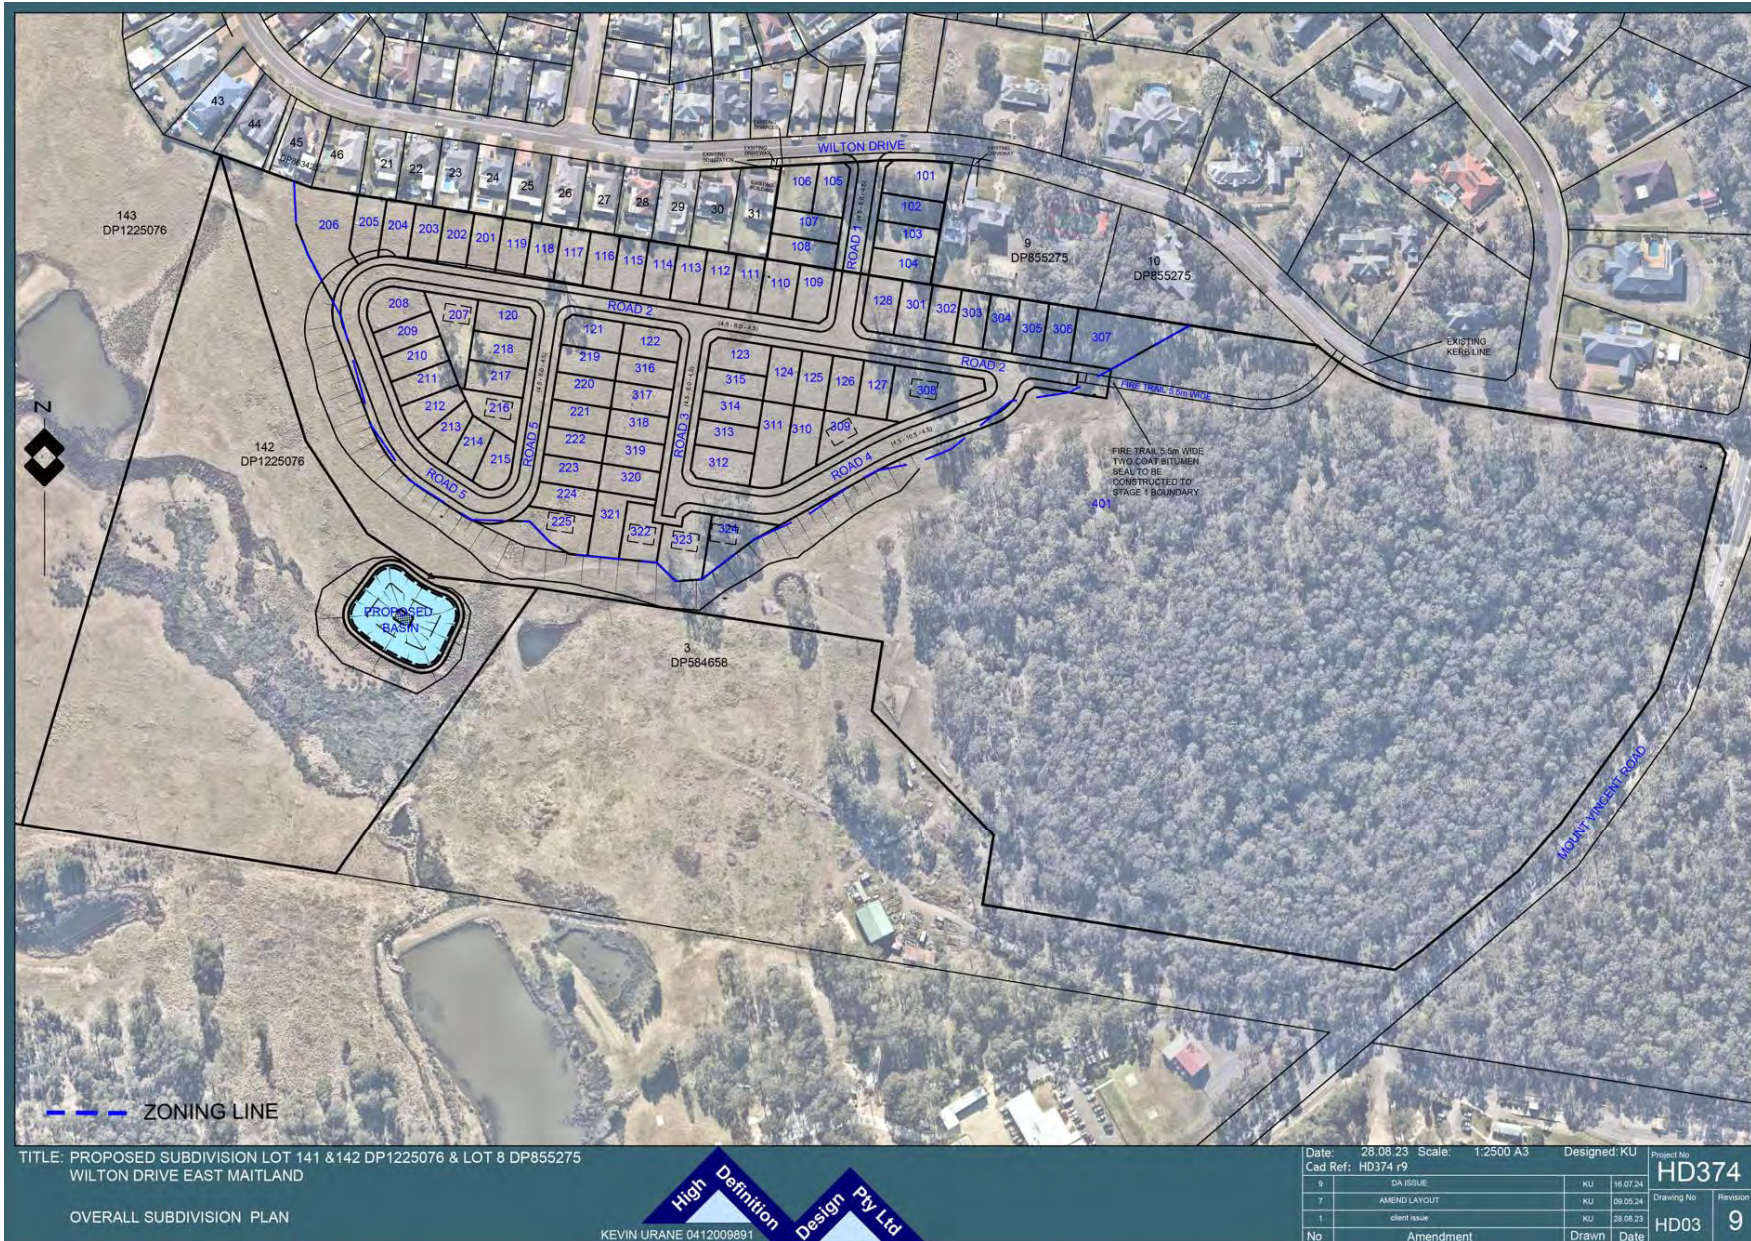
Subdivision staging plan (from HDD, dated 16.7.24)
